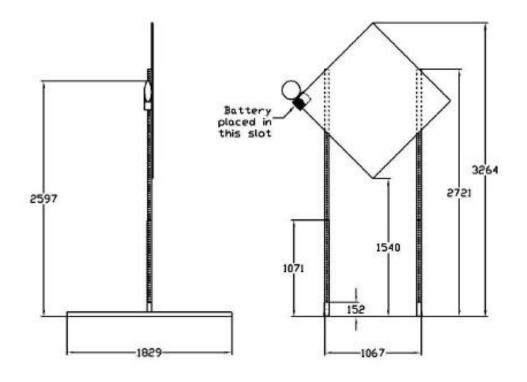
System No. 3 Sign Details, Test MNS-2 (9)
